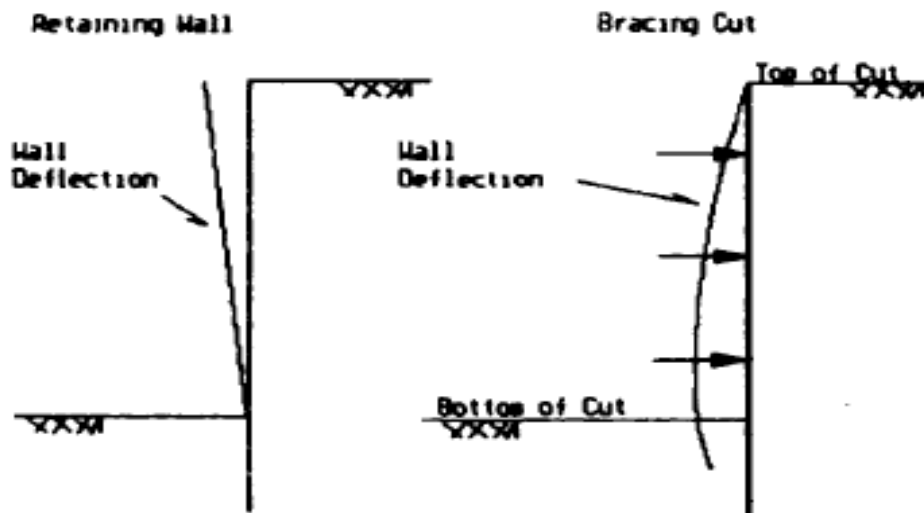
Nature of Yielding of Retaining Wall and Braced Cut (Das, 1990).
